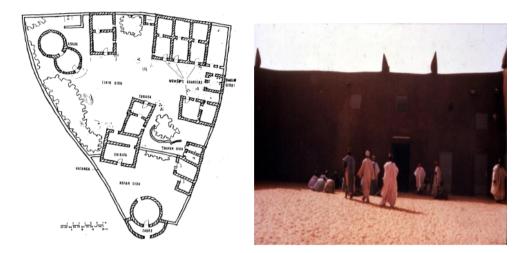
& 2: Typical Hausa traditional courtyard house plan: Source: Ruwan (1981)
